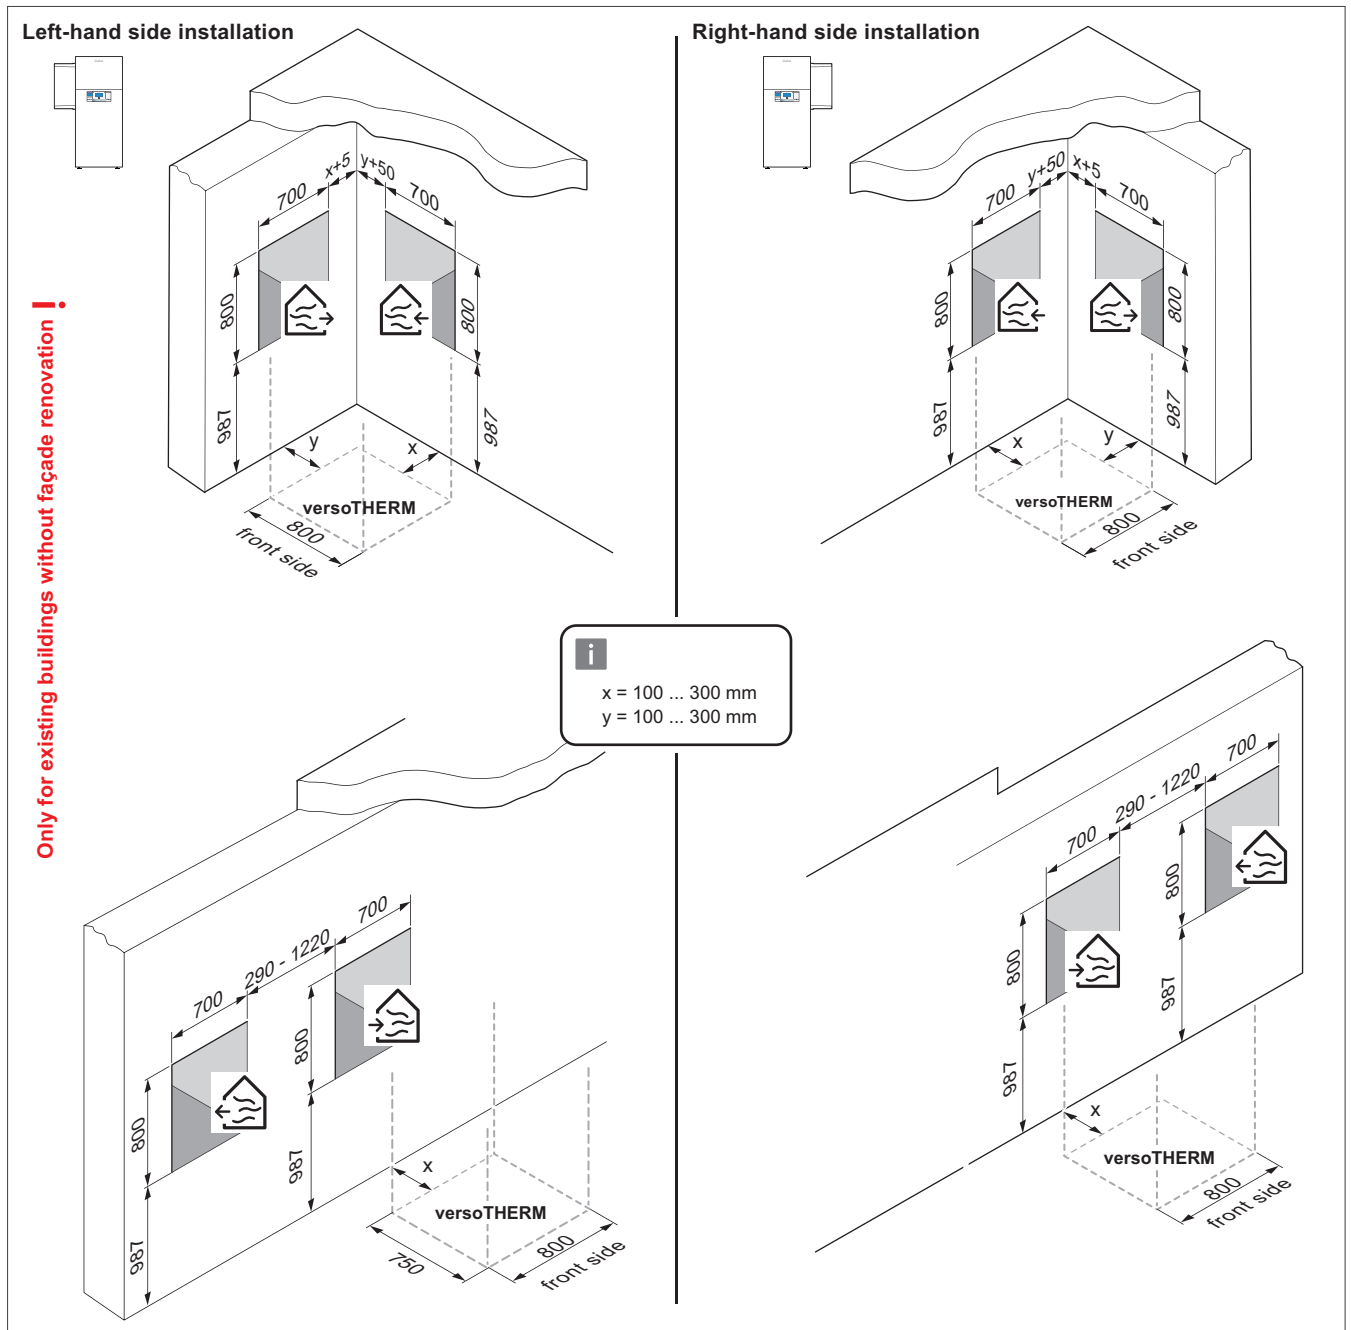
Wall-opening dimensions when using Vaillant air ducts
